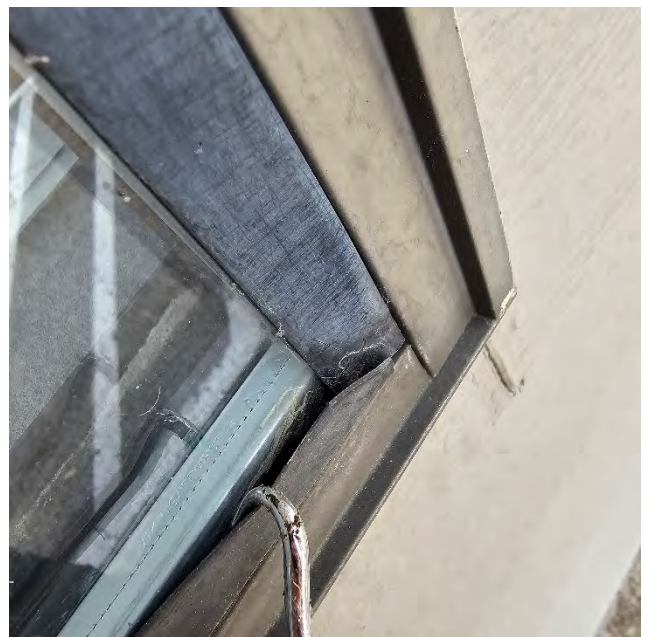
Sealant failure at West edge of North curtain wall
